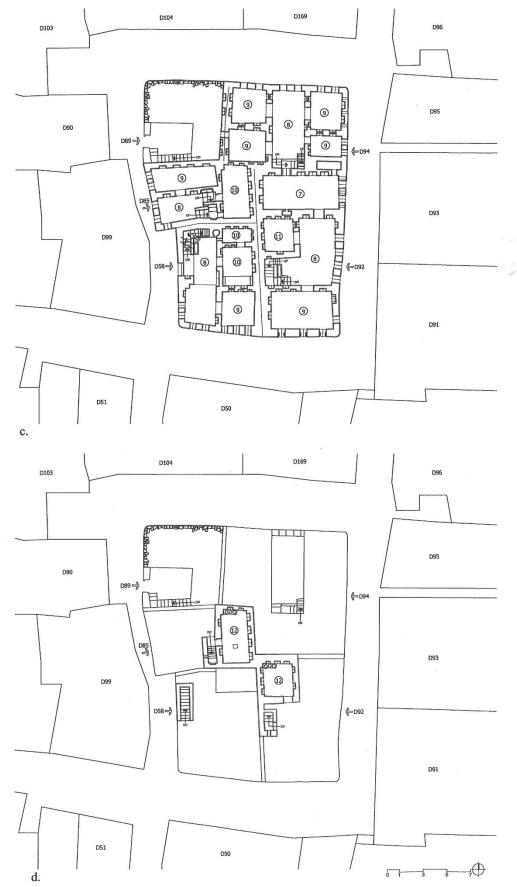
Continue of floor plans from Plate-19 of dwelling cluster D85, D89, D92 & D94; *c*. First floor; *d*. Roof and second floor; 1. main entrance door; 2. First *dahreez*; 3. Second *dahreez*; 4. *suffah*; 5. *caqid*; 6. *darss*; 6.*sblah*; 7. *sablah*; 8. *carshah*; 9.*gurafah*; 10. shade; 11. Kitchen store ; 12. Kitchen.
